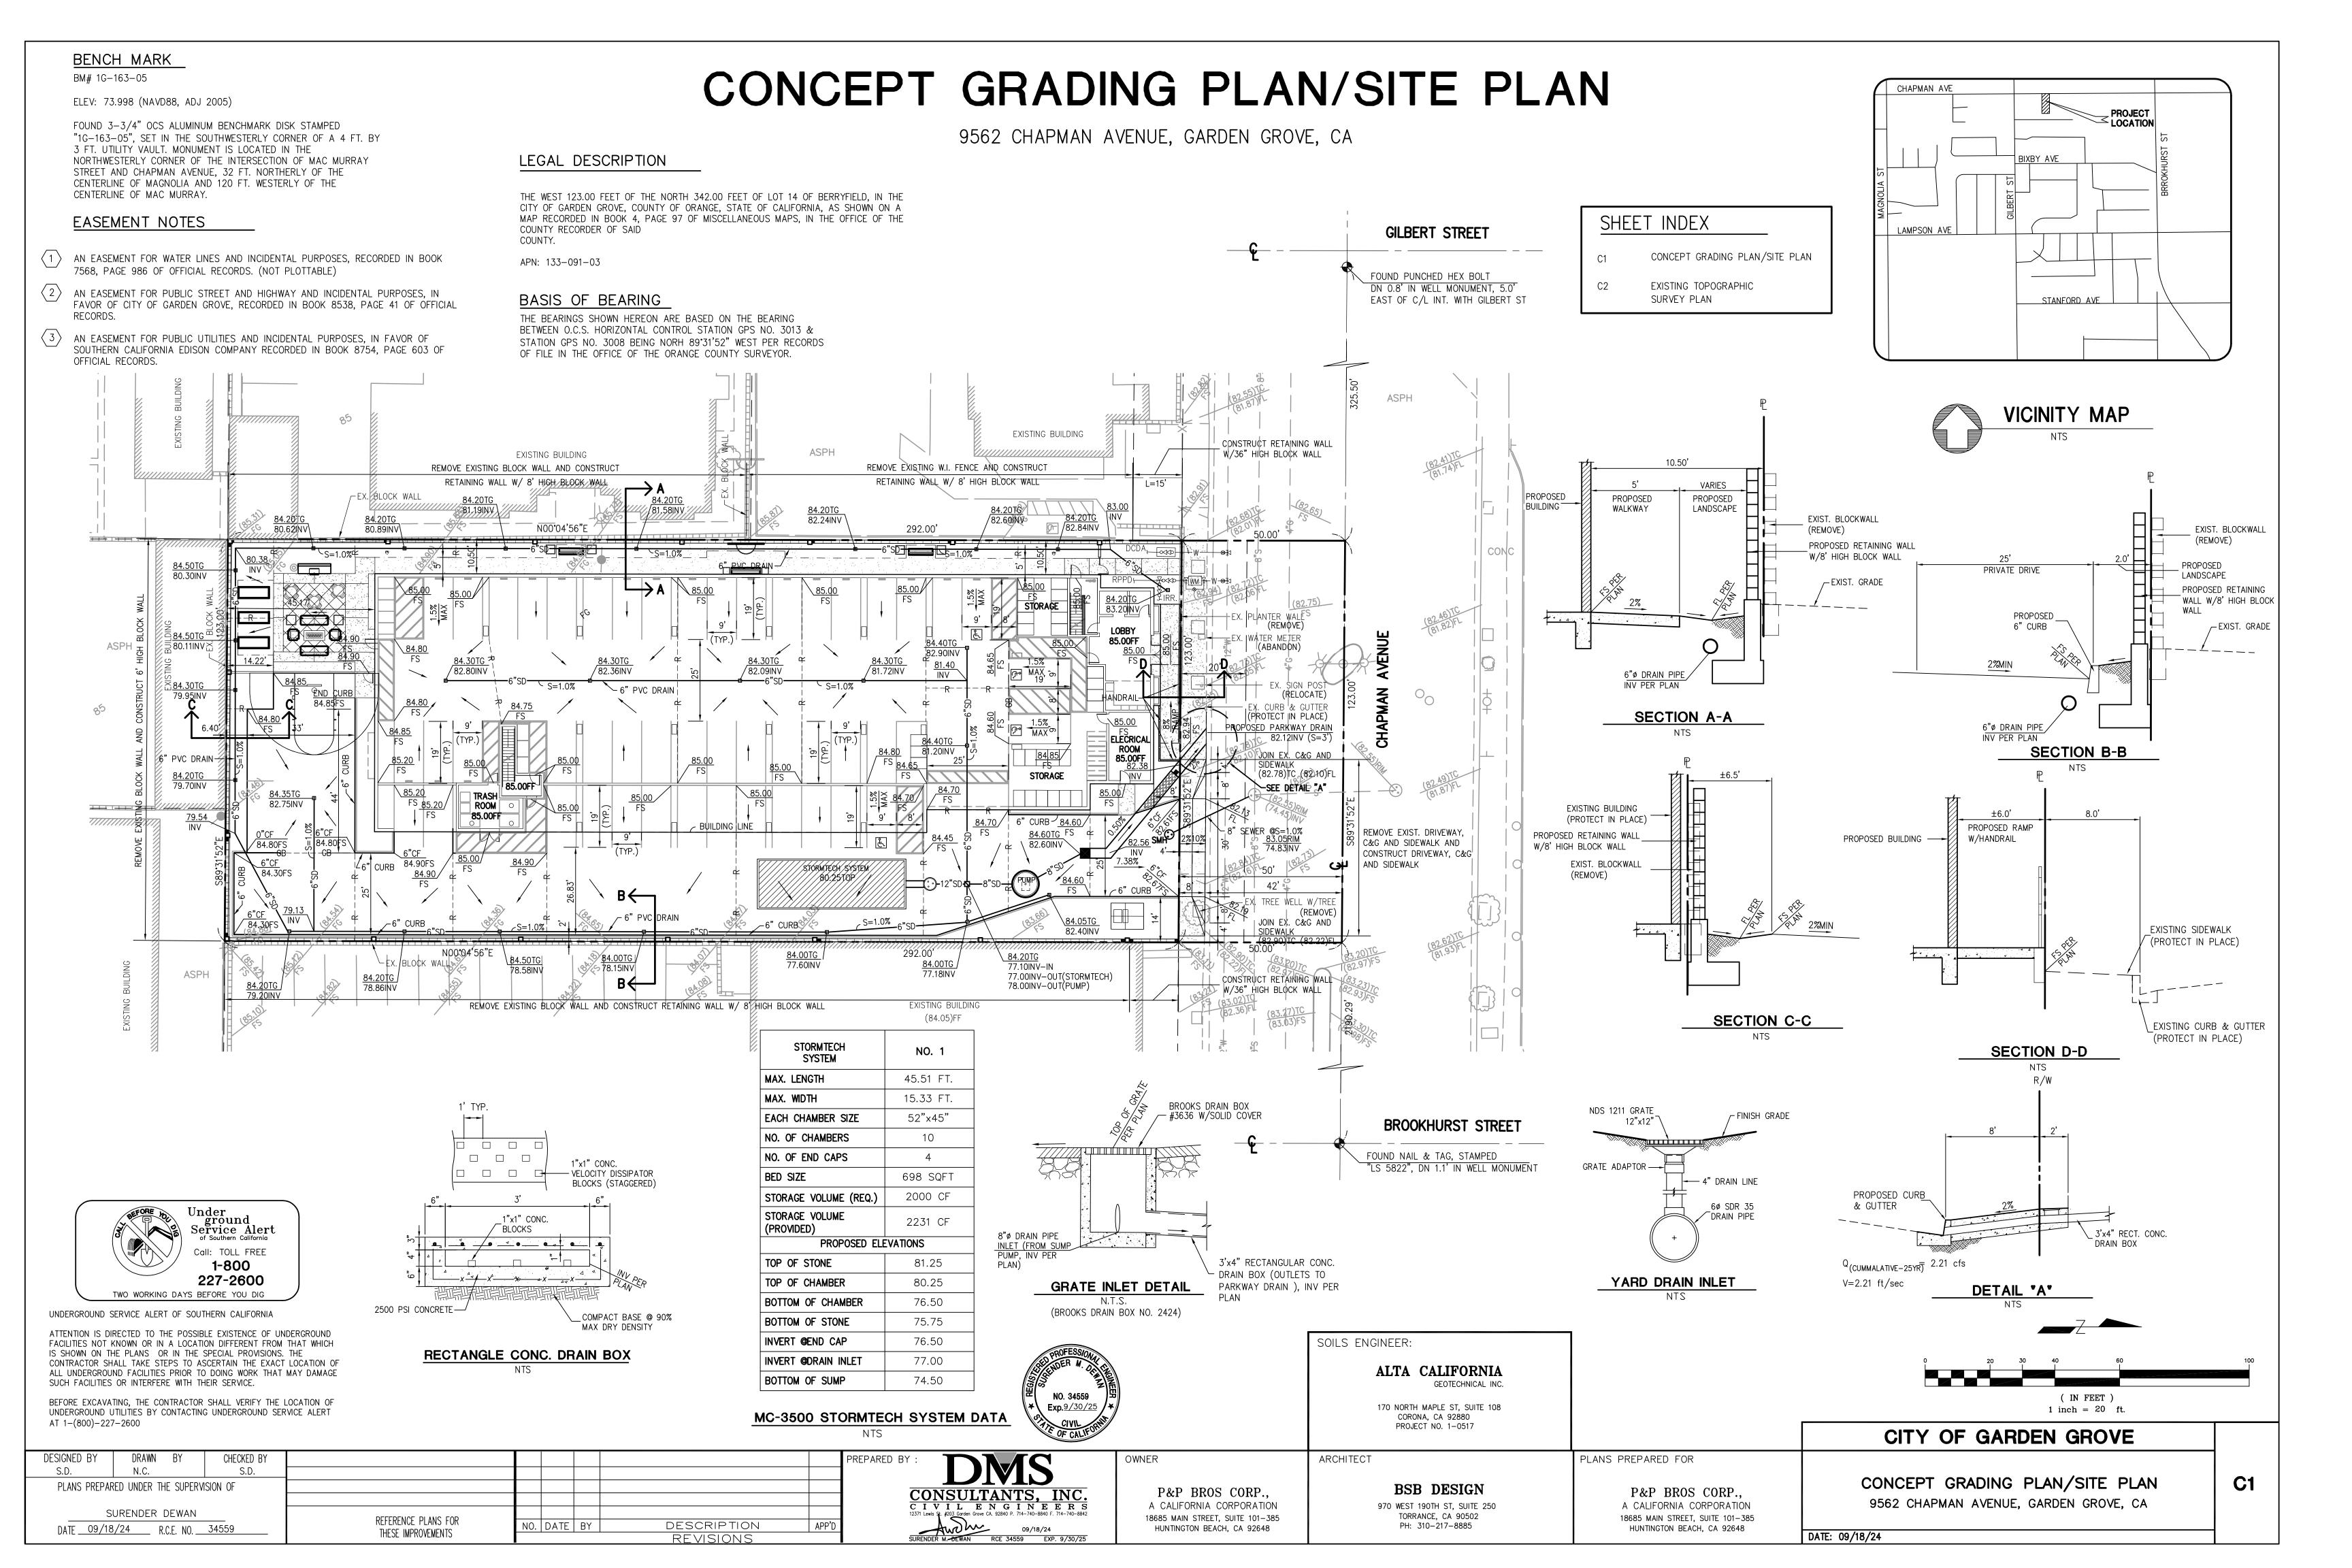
WQMP PLOT PLAN SELECTED STRUCTURAL BMP'S
